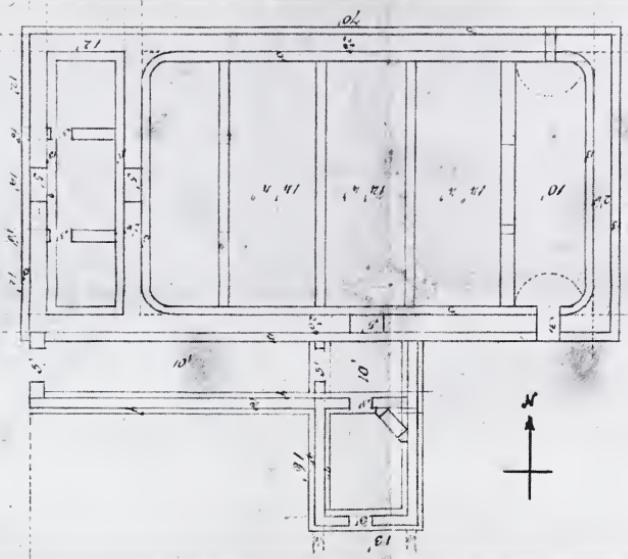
Early plan, foundation level, showing foundation, walls, corridor, south entrance, and nursery with fireplace for cooking lovefeast coffee. Also vaulted cellar under east end of church.
